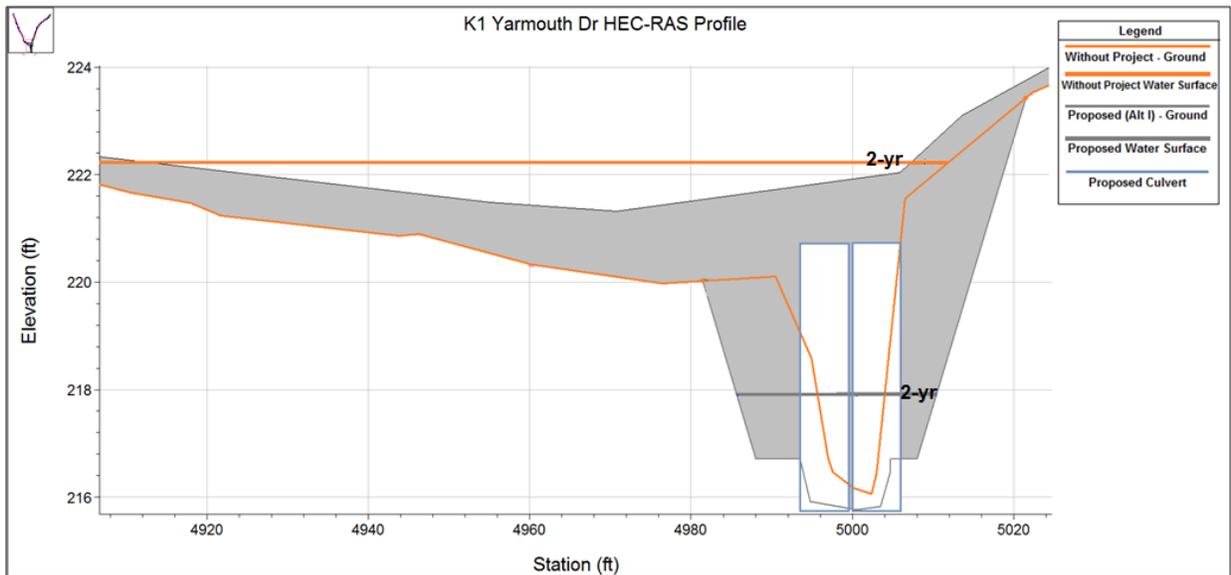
Figure X. Proposed Yarmouth Dr Culvert and Associated Reduction in Water Surface Elevation (At Inlet)
